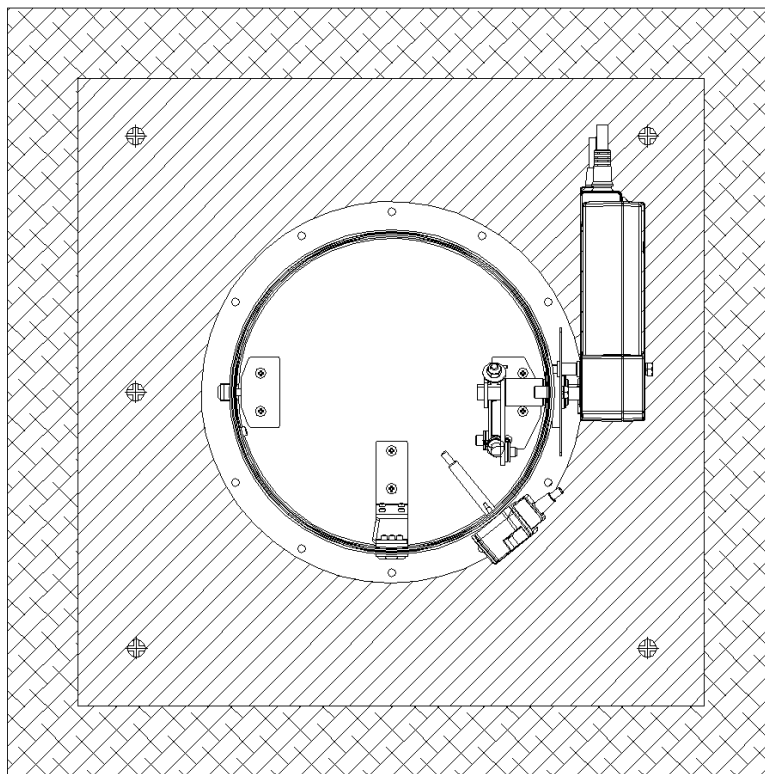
Installation method of fire dampers KTS-O in flexible wall with horizontal rotation axis of baffle
